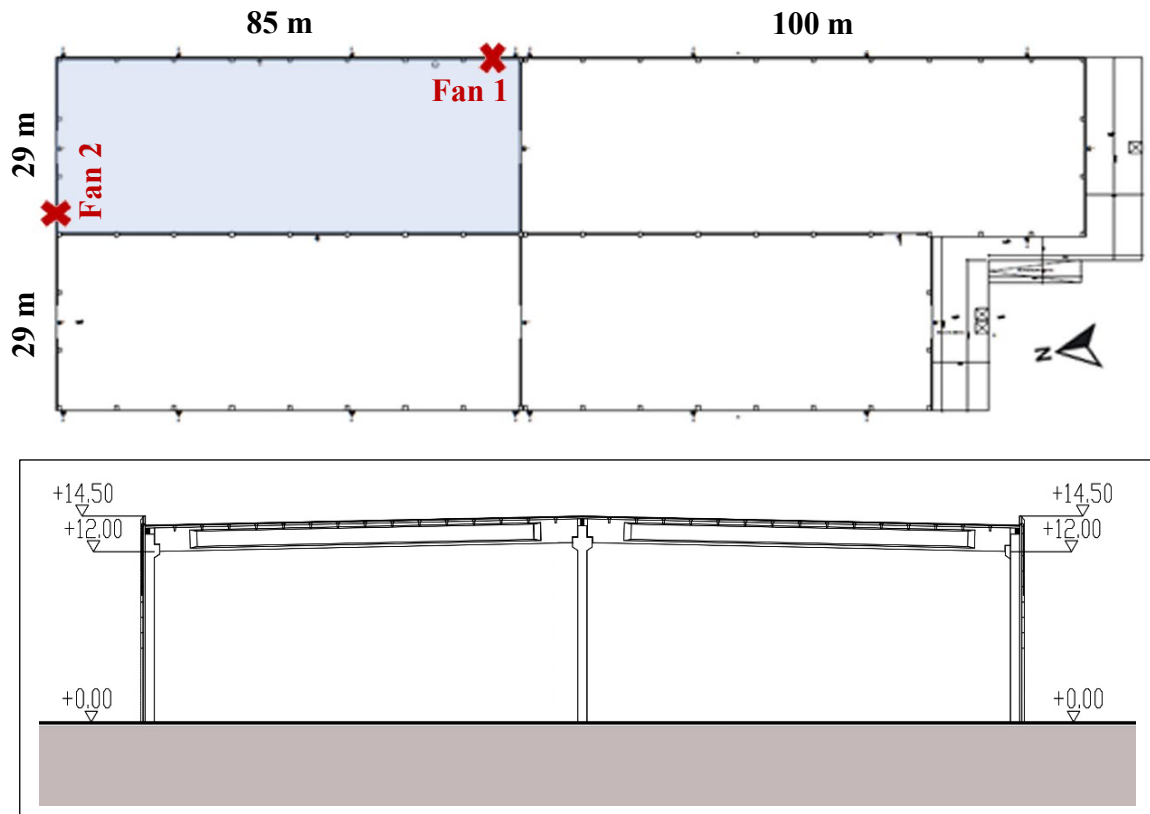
Schematic plan (up) and section (down) of the storage zones
